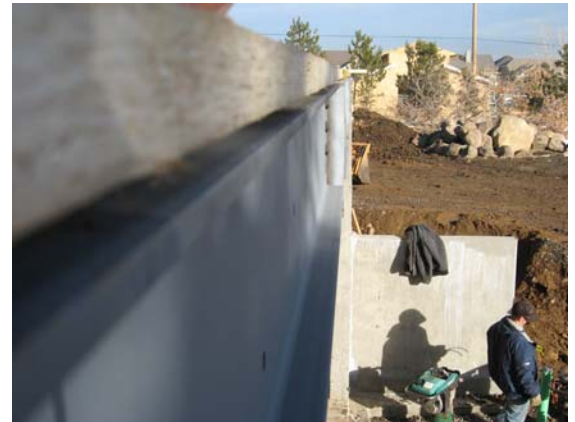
SPACING BETWEEN HEADER AND SHEATHING.
